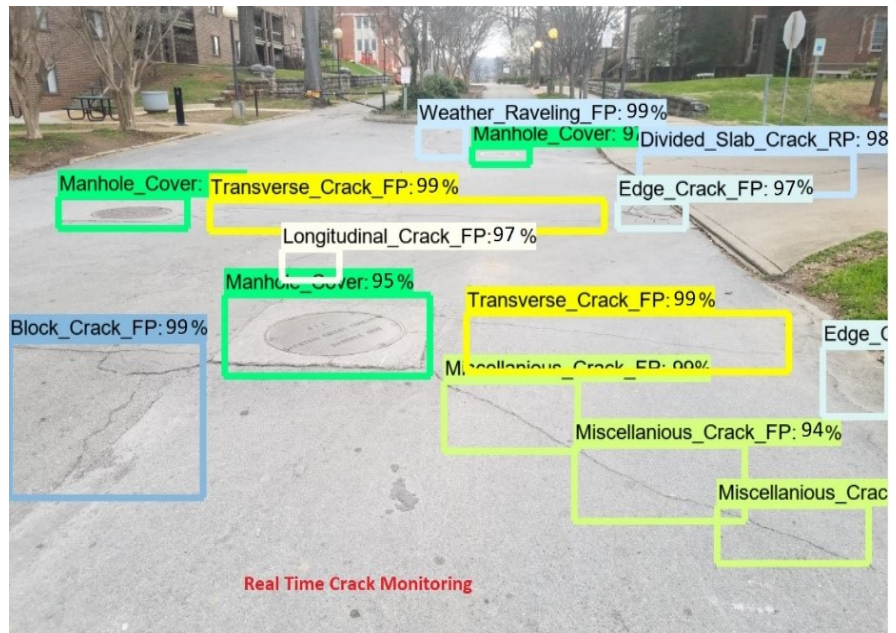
Pavement crack detection using Faster RCNN with 98% confidence.
